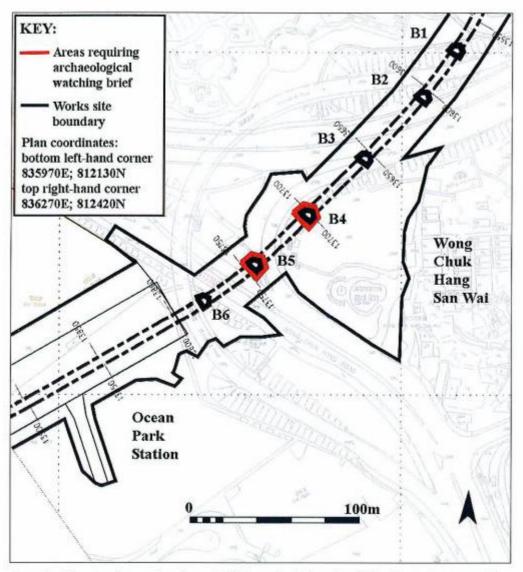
Plan showing works site west of Wong Chuk Hang San Wai with viaduct supporting columns B4 and B5 requiring archaeological watching brief outlined in red.
